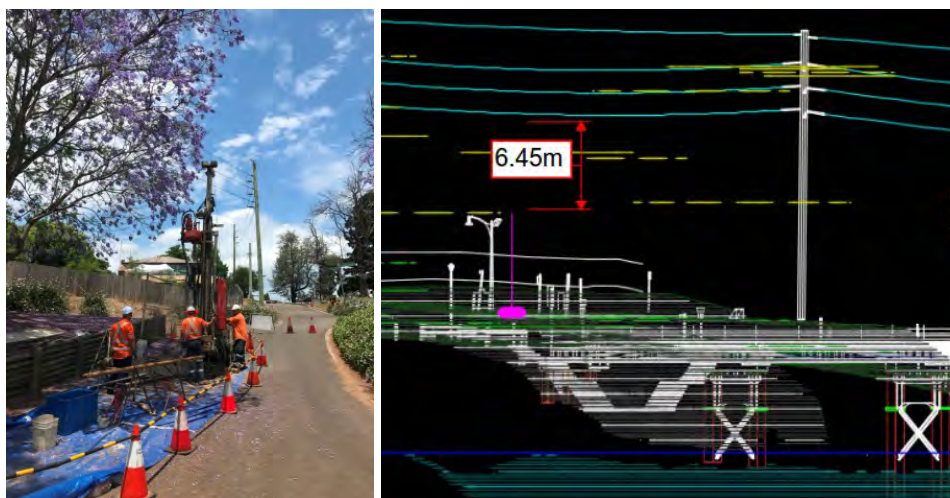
Geotechnical drilling works on site and survey clearance checks.
